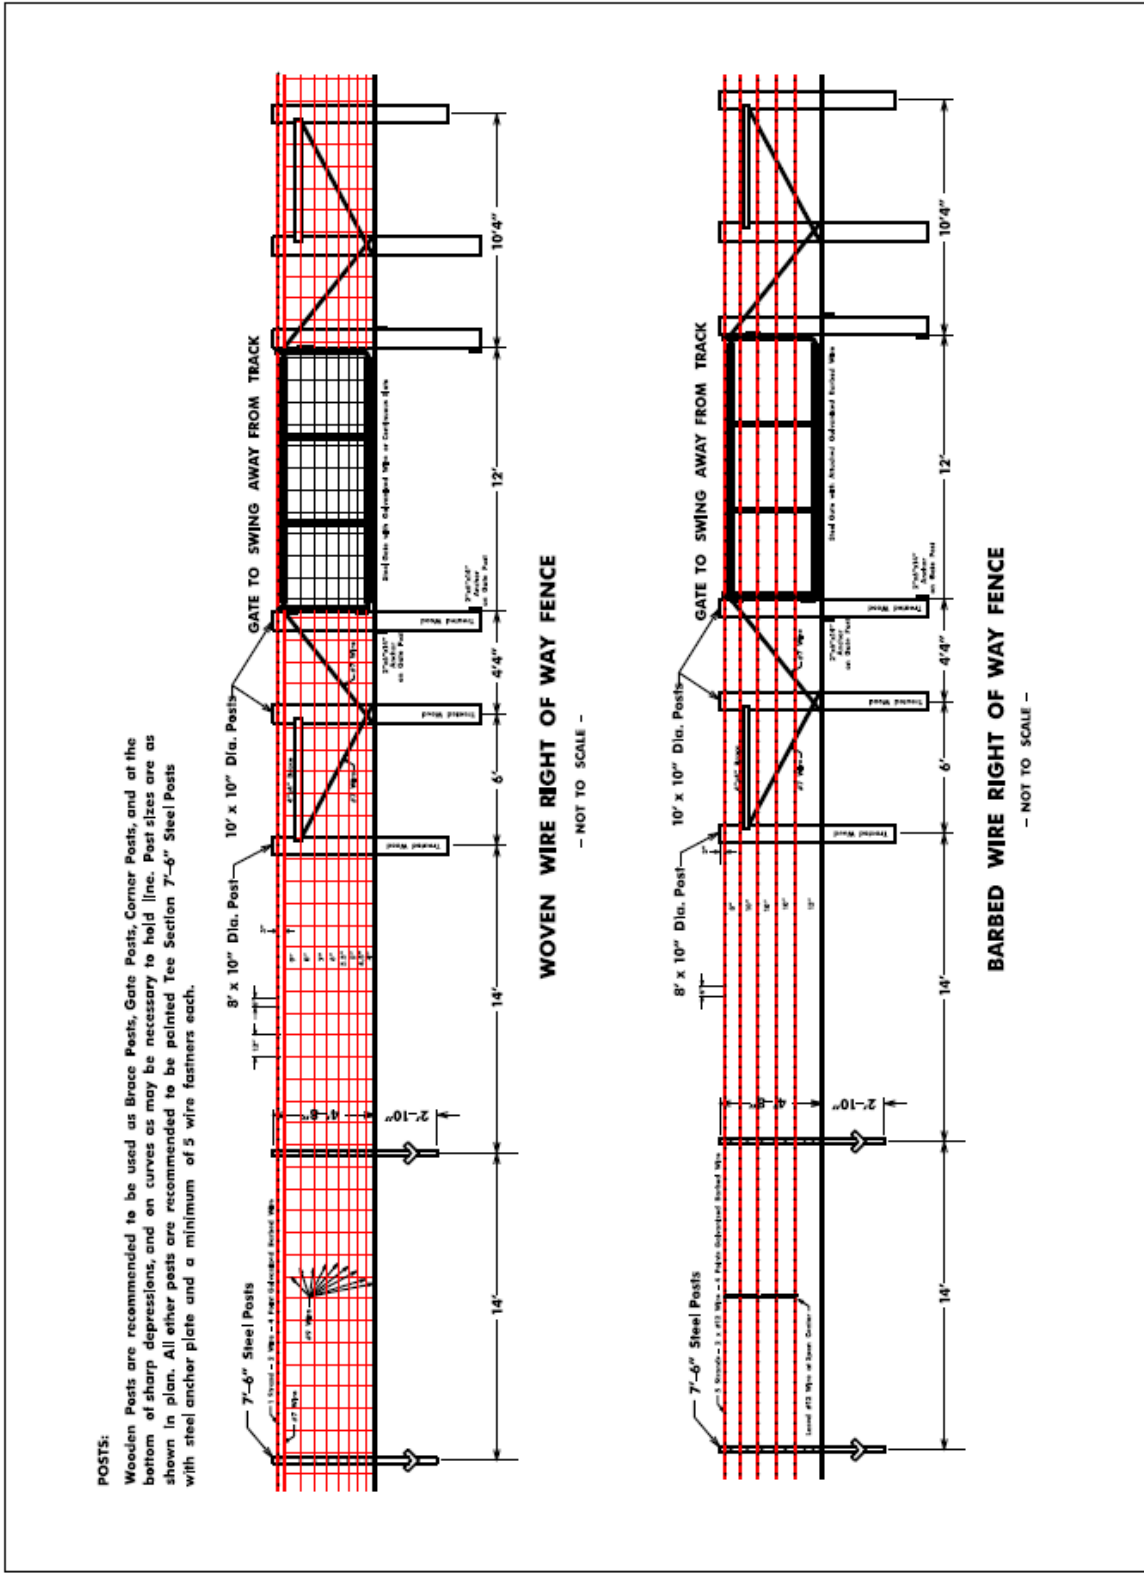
Representative design plan for a Woven Wire and Multi-strand Barbed Wire Right-of-way Fence
